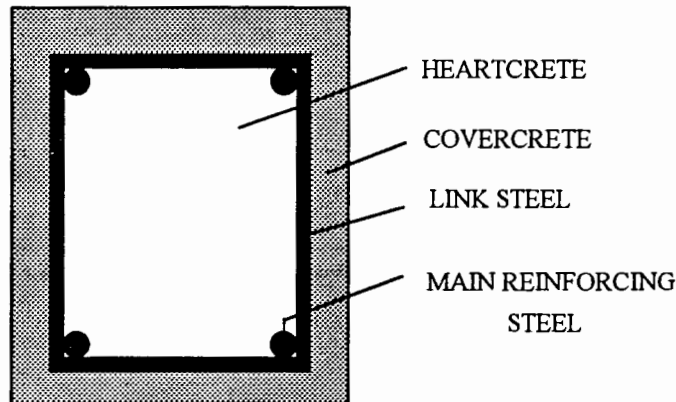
Section through a reinforced concrete member ^(2.3)
